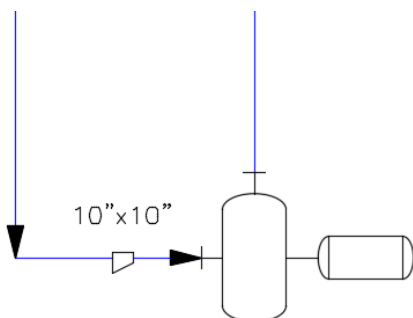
An eccentric reducer placed on the line connecting the first pump
